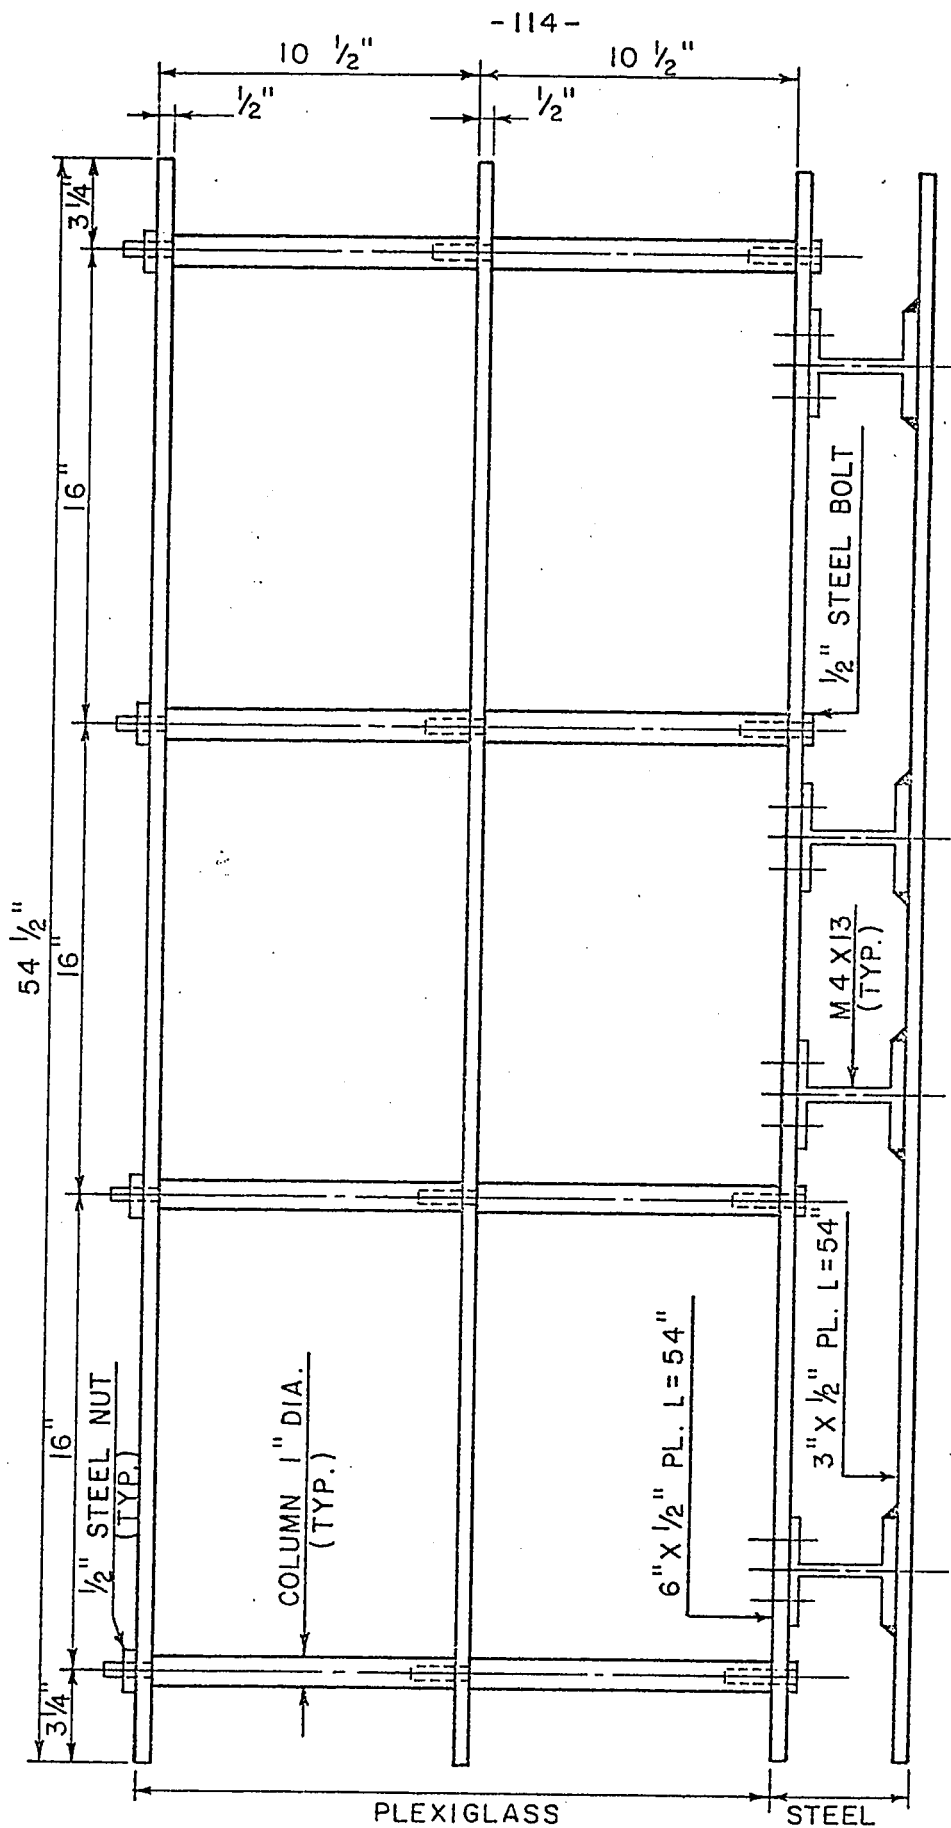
ELEVATION OF TEST STRUCTURE
